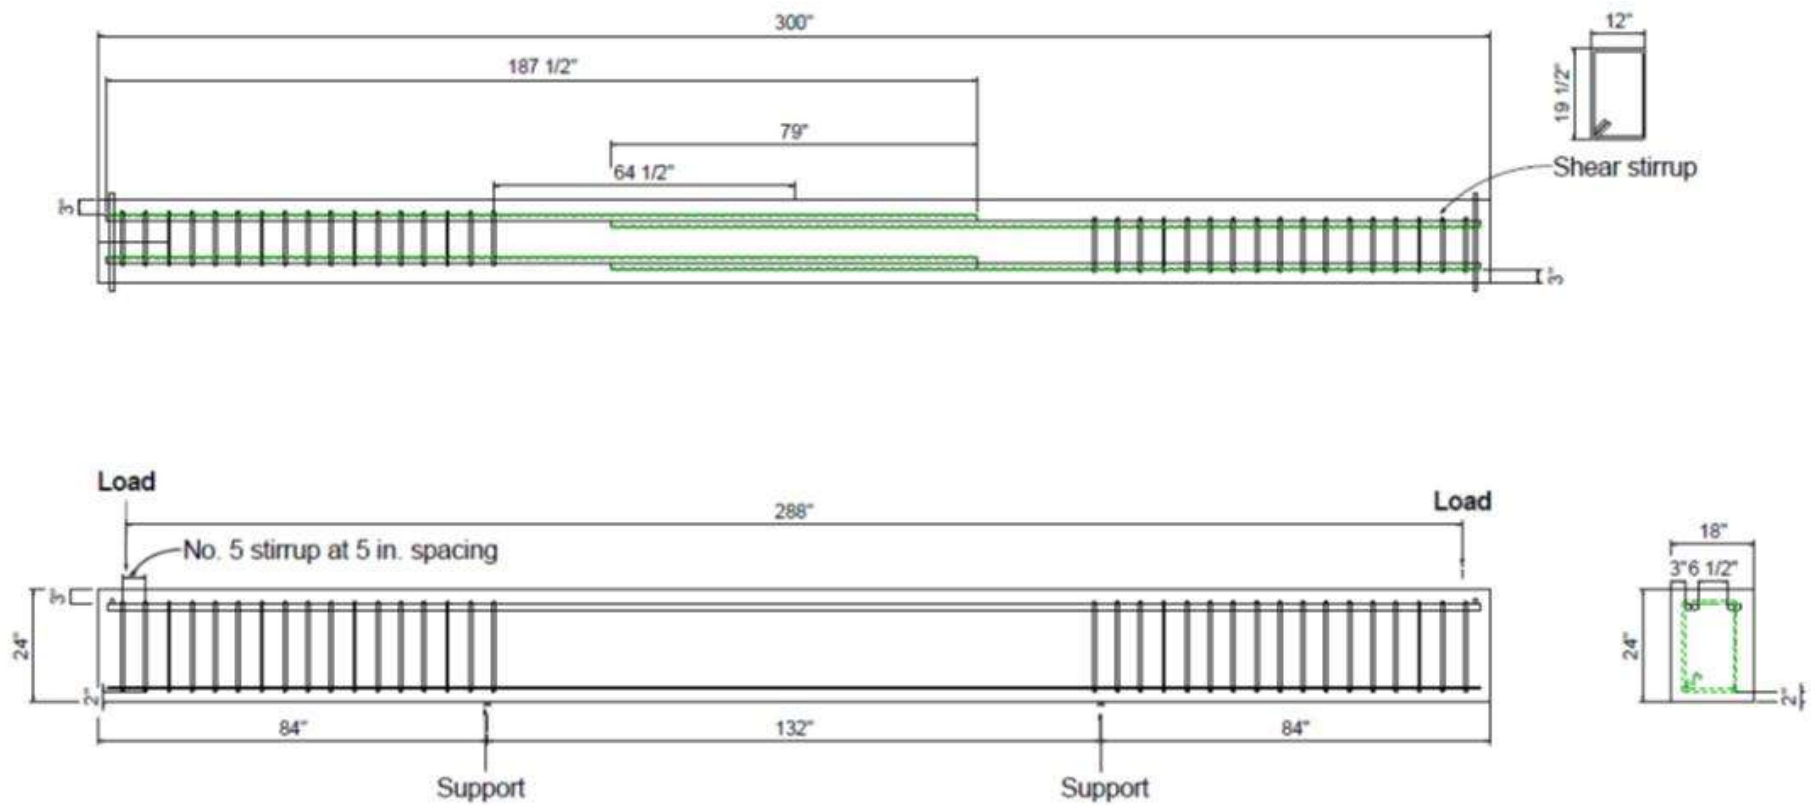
Reinforcing steel drawing for beams with 79 in. splice length - monolithic
